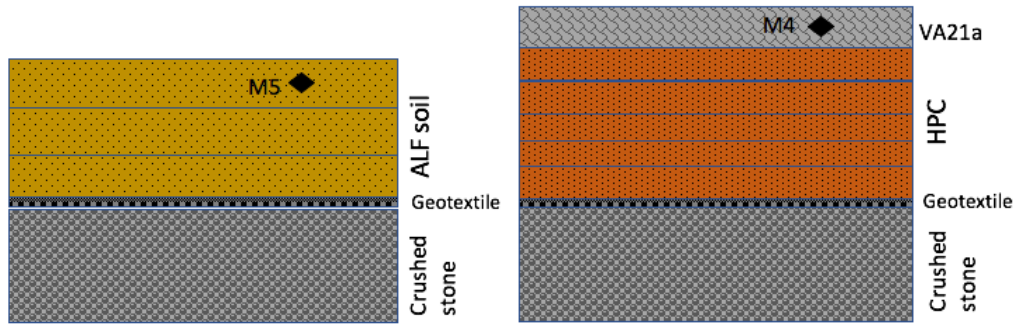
Test pits soil layers' profile and embedded VWC sensor location, pit 1 (left) and pit 3 (right picture).
